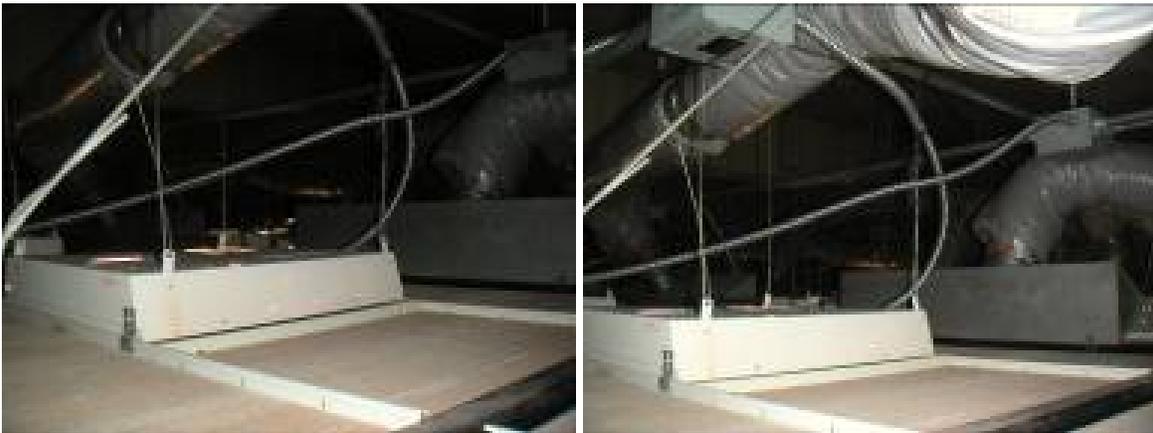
Safety wires observed on light fixtures in grid control room ceiling
